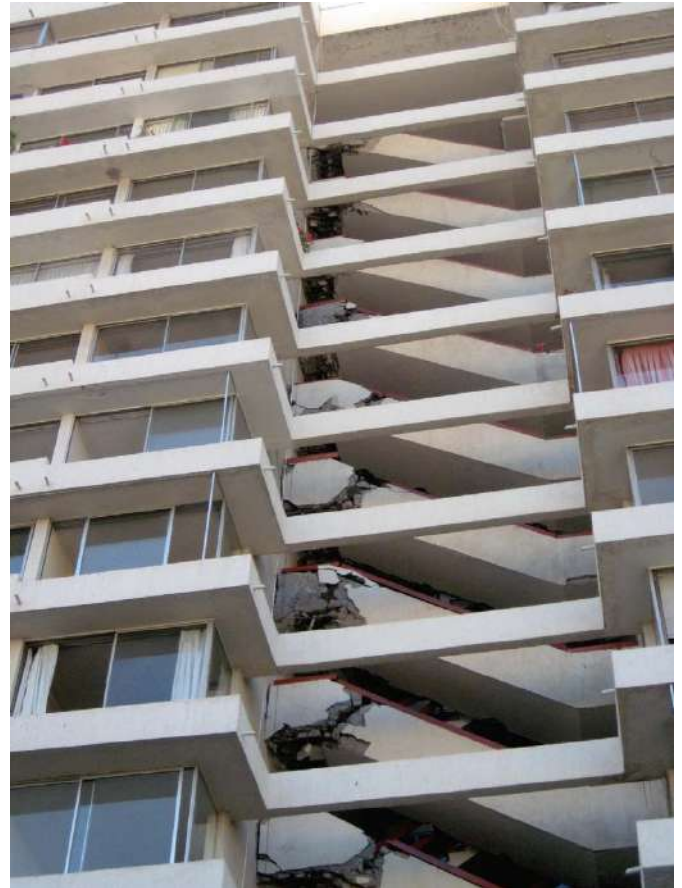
Stairs damaged up the full height of this apartment building in Viña del Mar in the 2010 magnitude-8.8 Chile Earthquake (Photo courtesy of Santiago Pujol, Purdue University). The stairs were rigidly attached at adjacent floors and behaved like diagonal braces although they were neither designed nor detailed to function as structural braces.
